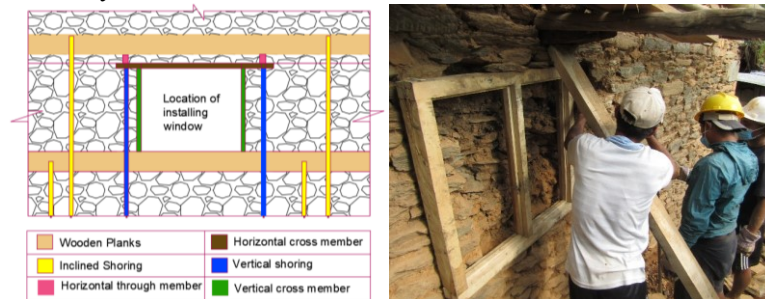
Drawing showing shoring provided while installing a window (left) and a picture of similar case while implementing (right) (©NSET)
